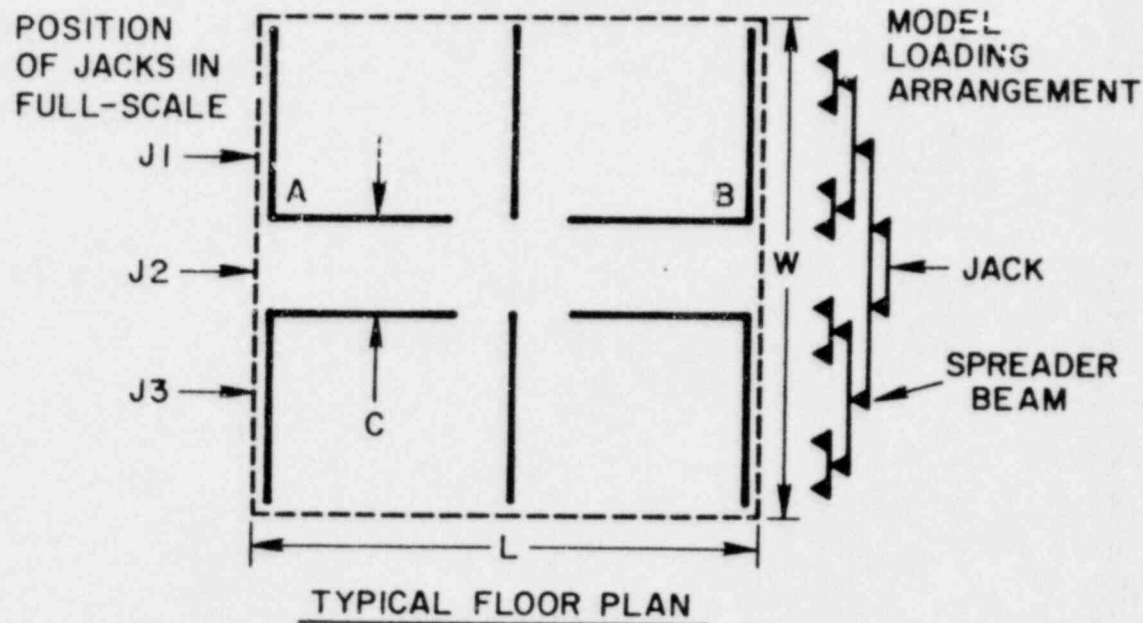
CROSS-WALL TEST STRUCTURE
